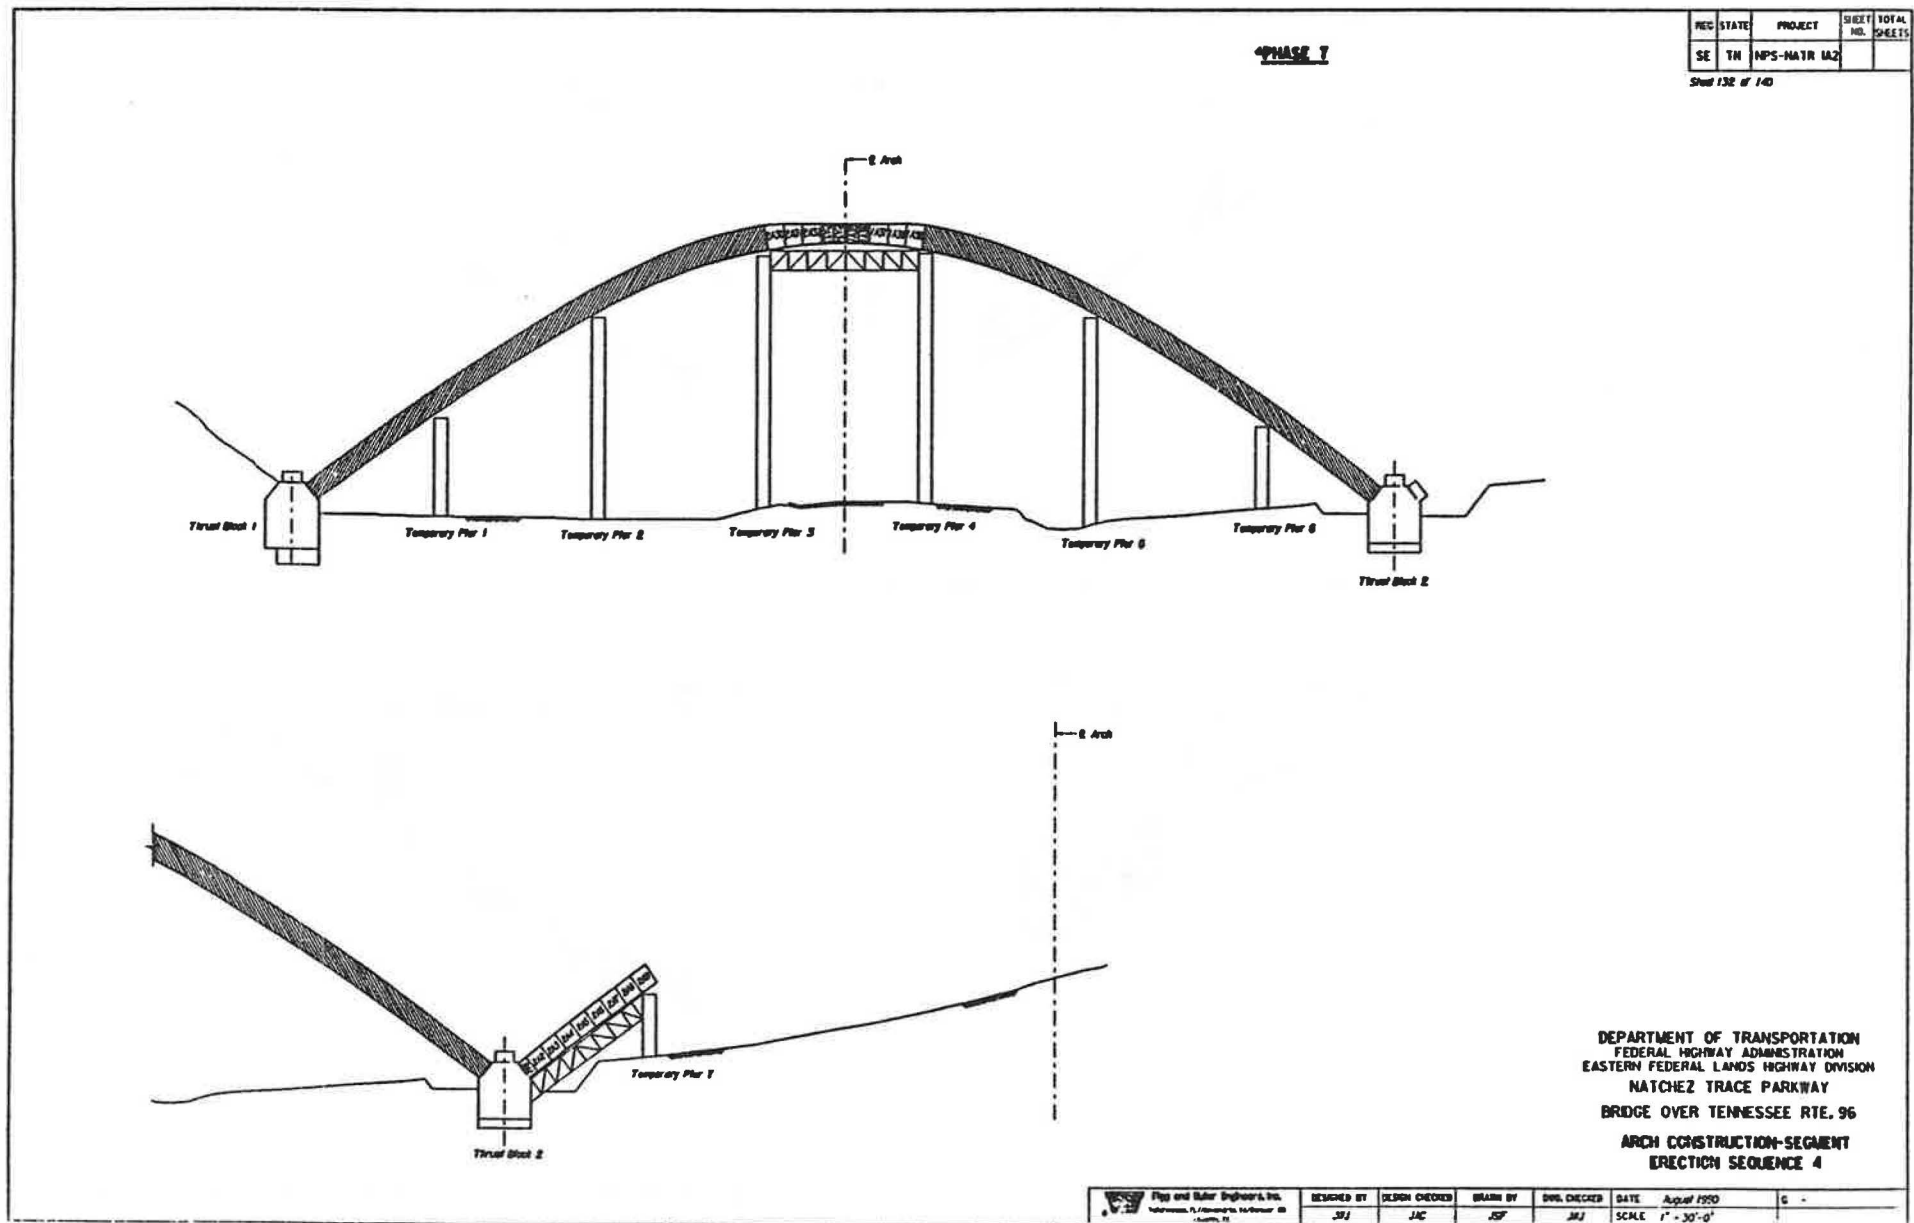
Arch construction - precast alternate - phases 7 and 8
